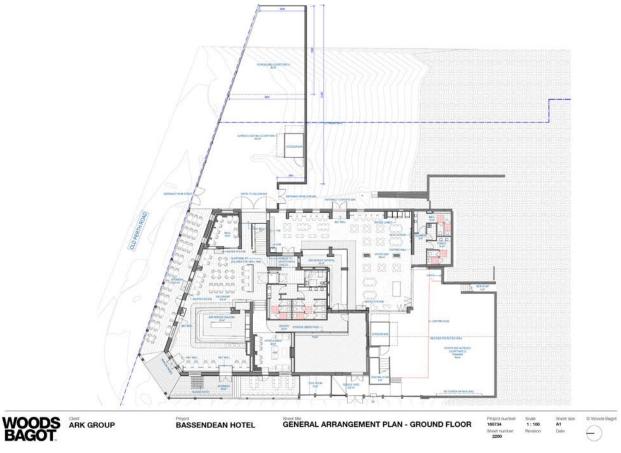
Excerpt from the General Arrangement – Ground Floor Plan. (Client, 26 November 2020).
